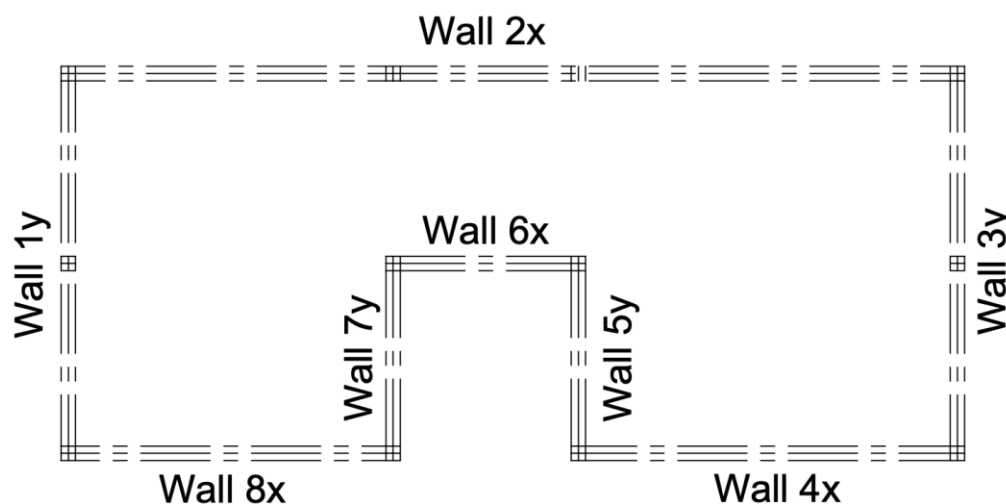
Layout of the wall lines for the NEESWood two story light wood frame building
